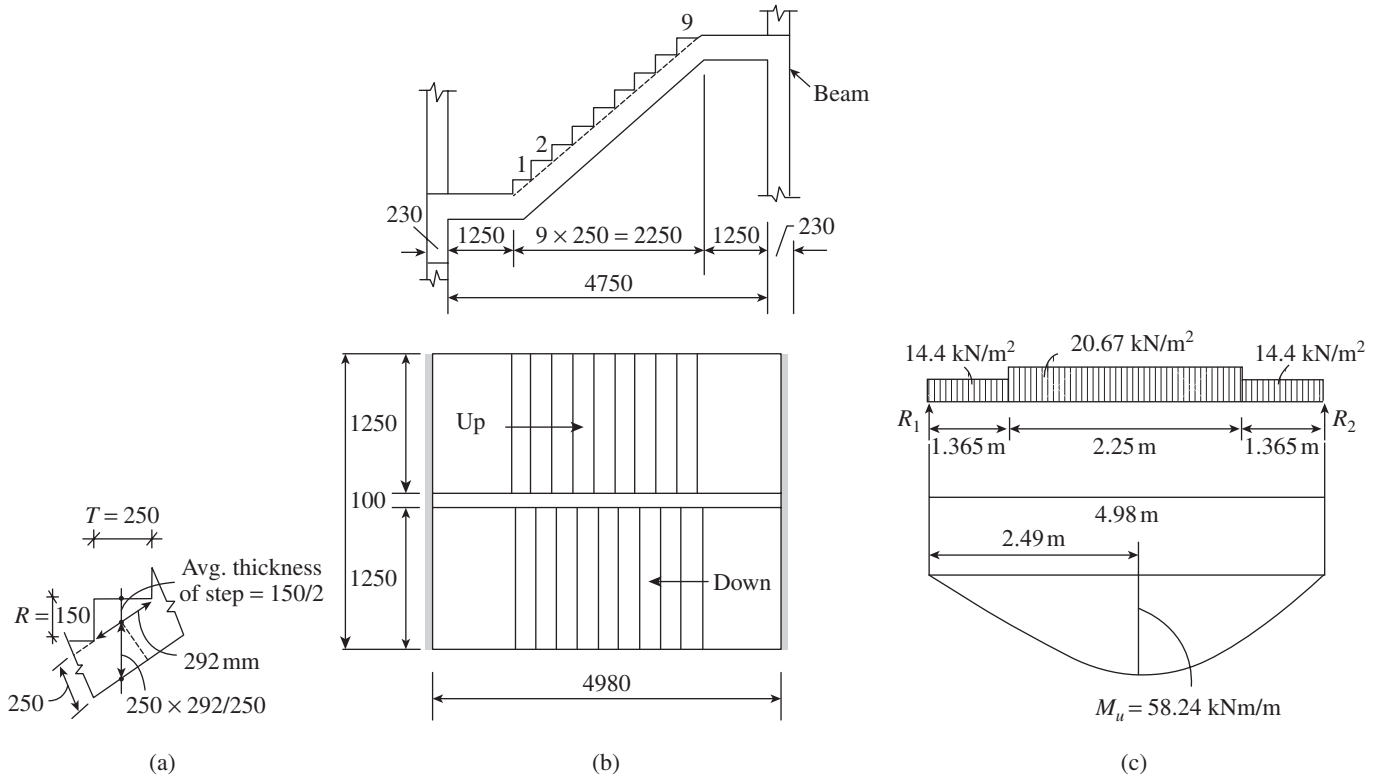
Dog-legged staircase of Example 17.6 (a) Steps (b) Stair (c) Loading
